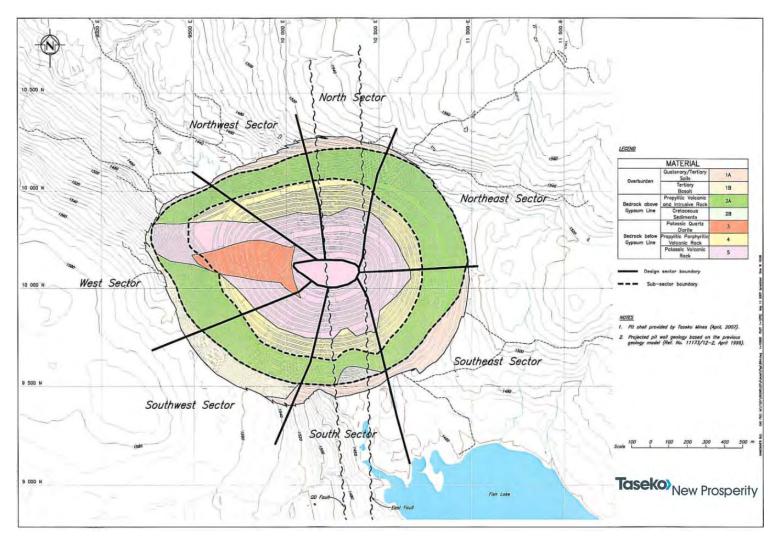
Geotechnical Pit Slope Design Sectors Plan
